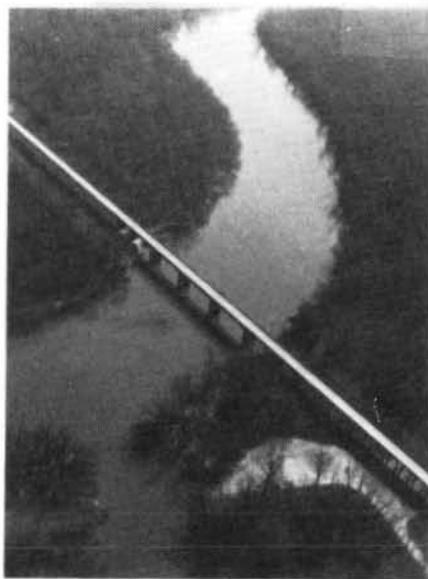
S. C. 34 HIGHWAY BRIDGE (R.M. 116.1)
